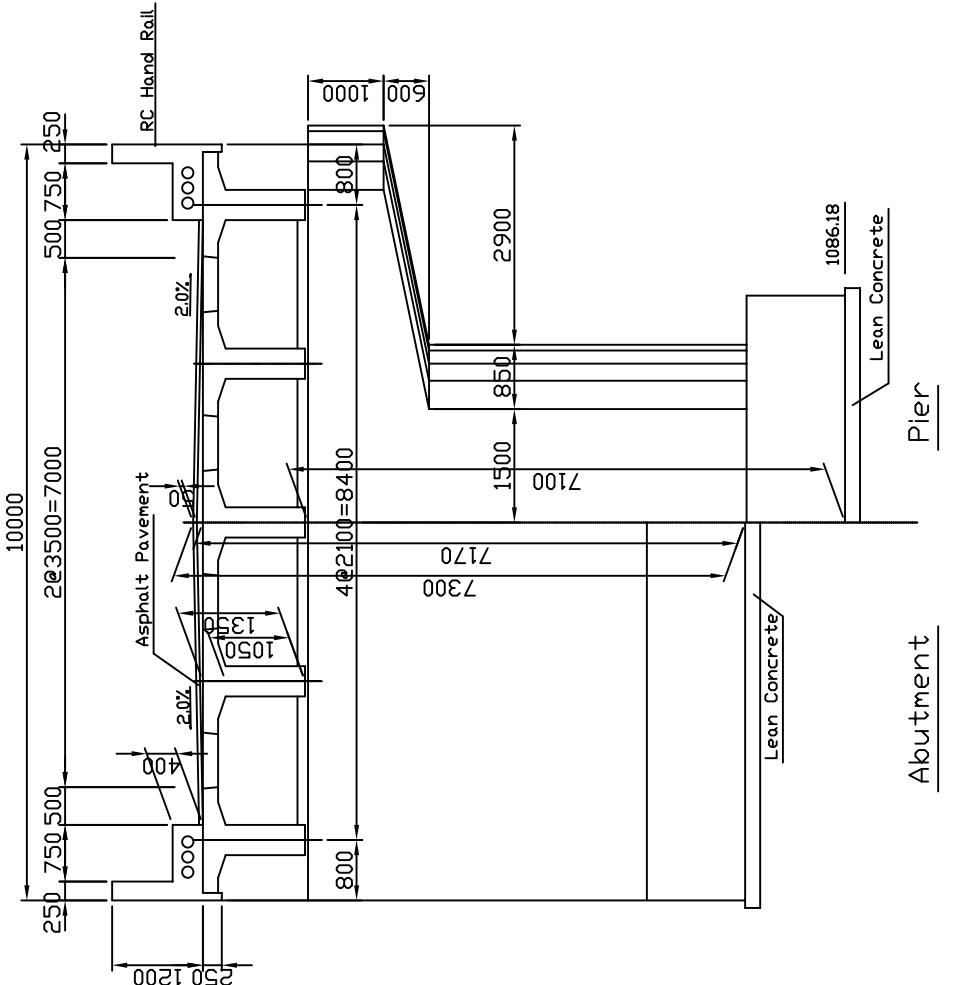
West Undurkhaan Intersection (Section VI)
